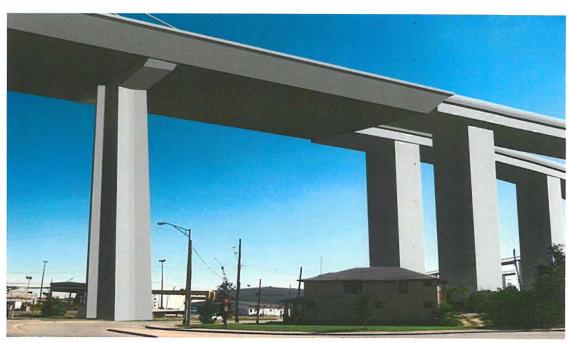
Union Hall looking south toward Alternative B rendering.
